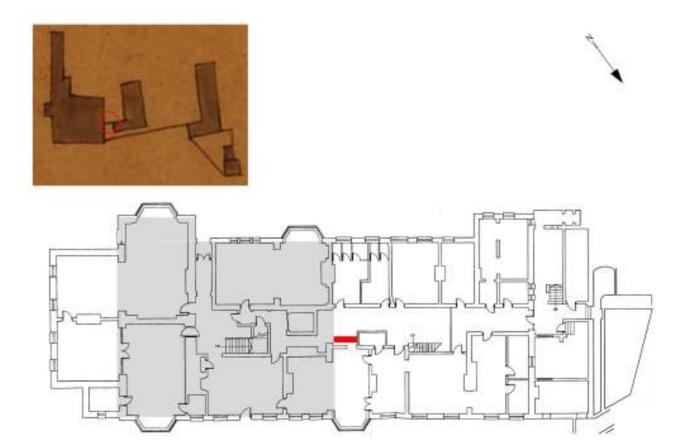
Plan of the modern house, showing the location of wall (109), alongside an early 19th Century plan with this wall ringed.
